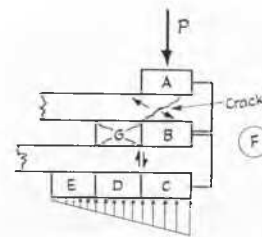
Causes of shear cracks in headers at point F of crib wall (Fig. 2).
